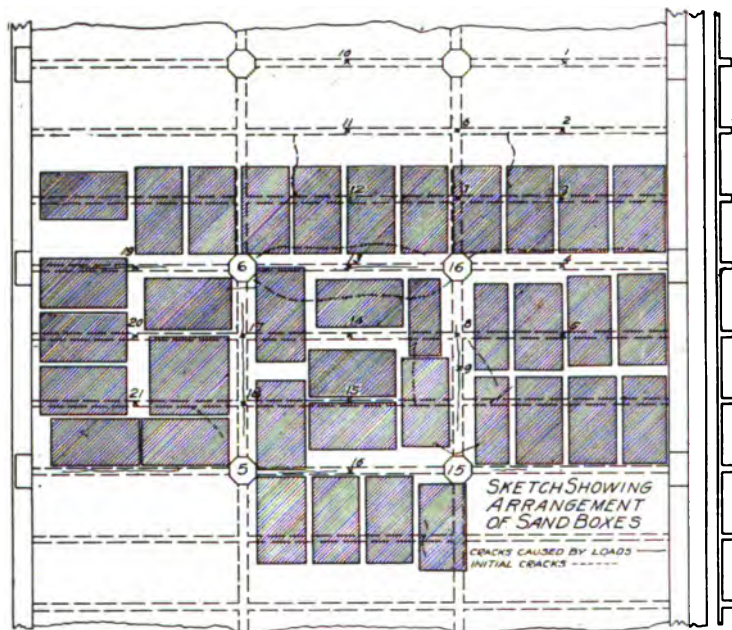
LOCATION OF SAND BOXES AND FLOOR CRACKS.
